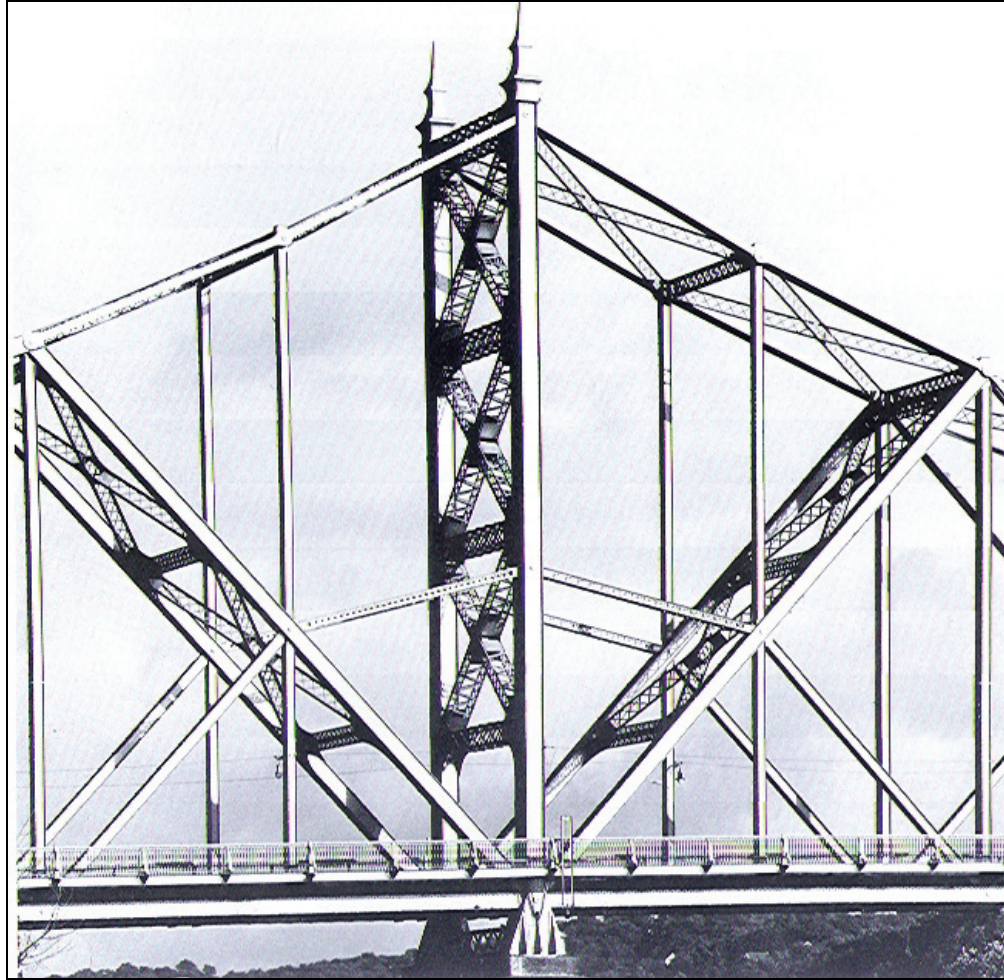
Portal Braced Frames at Intermediate Pier Support of a Through Truss (Plowden)
